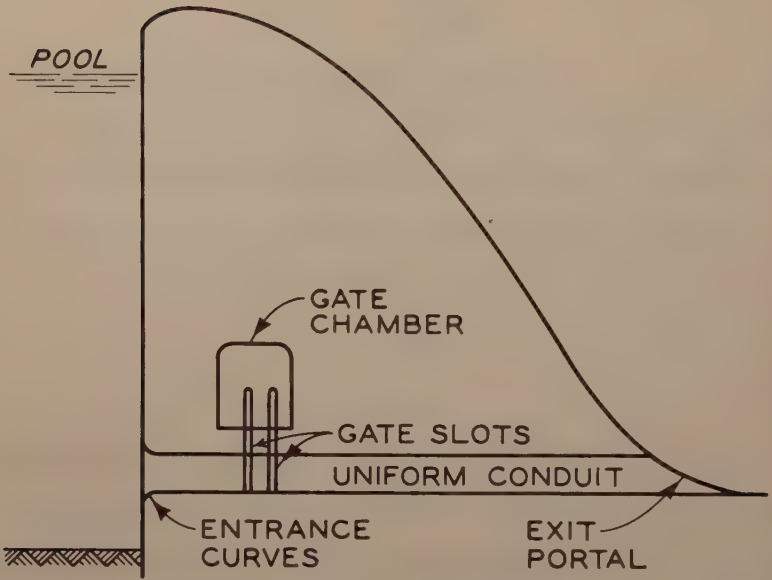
ELEMENT OF A TYPICAL CONDUIT
